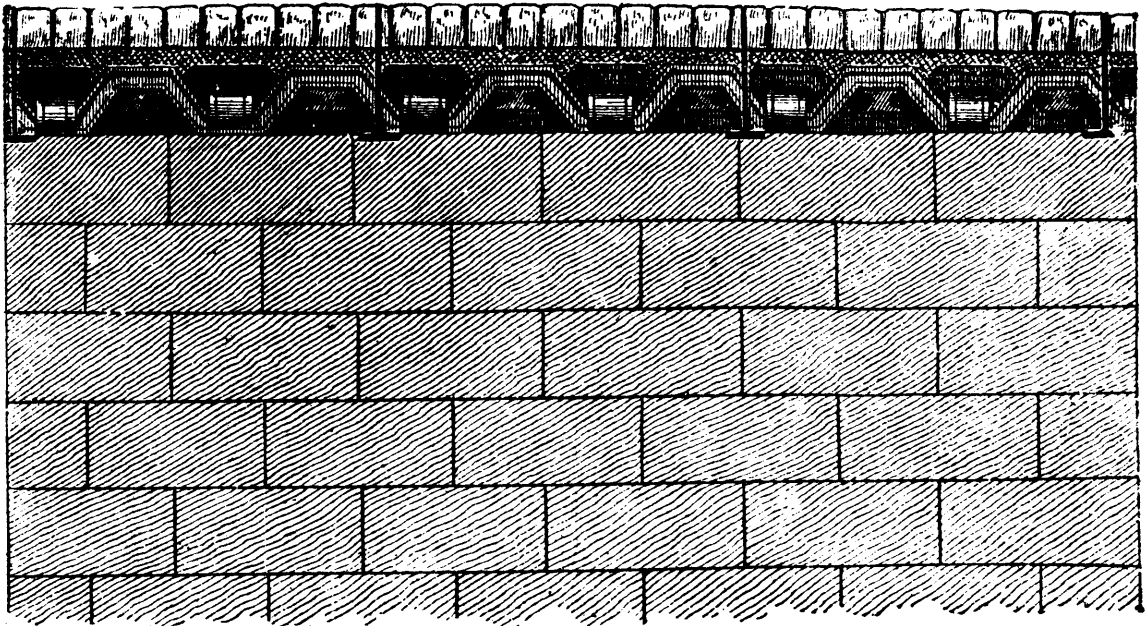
RETAINING WALL AND SECTION OF ROOFING.
